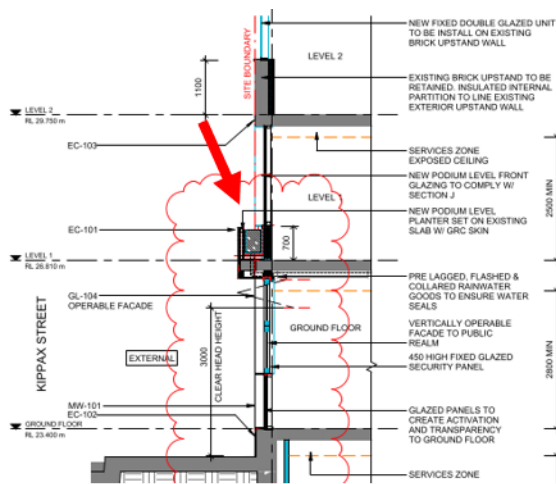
Section drawings showing projecting planter boxes (Kippax Street and Terry Street).
